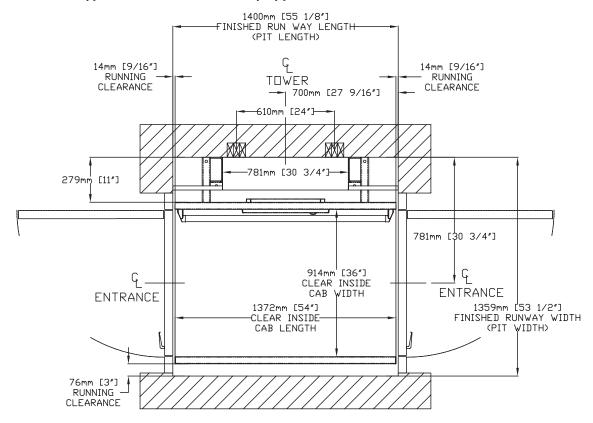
Plan View - Type 2, 36" x 54" Cab, Enclosure Application
